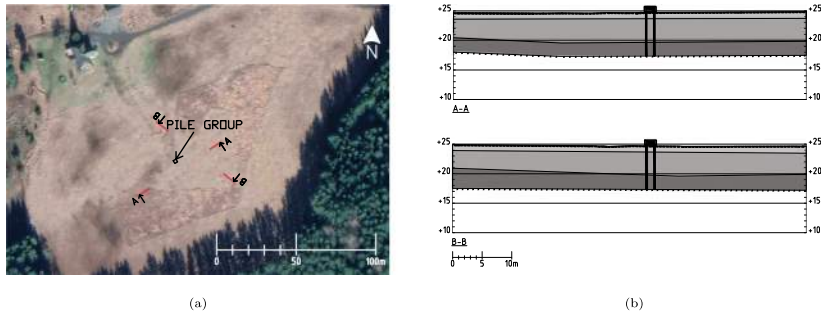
Overview of the site with (a) an aerial photography [43] with the location of the pile group indicated and (b) two sections with the stratification interpreted from geotechnical site investigations with a layering of dry crust clay (light gray), saturated soft clay (medium gray) and till (dark gray) on top of a stiff bedrock.
